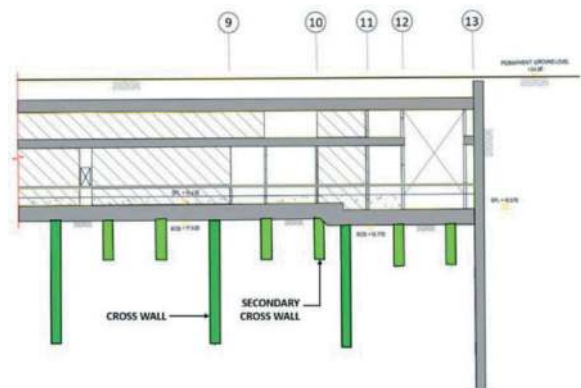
Secondary cross walls added at the eastern portion of the HKLX box.
